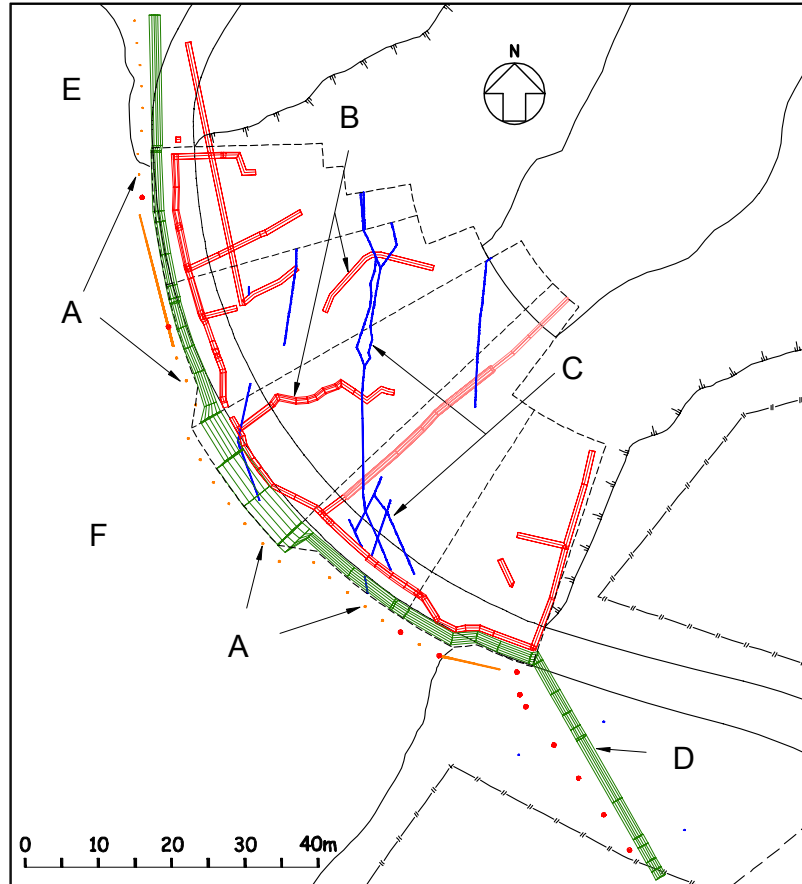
Plan view of Arapuni Dam, New Zealand. The position of the foundation defects (“the feature”) as determined during construction is shown. The diversion tunnel curves to the south of the cut off wall.
